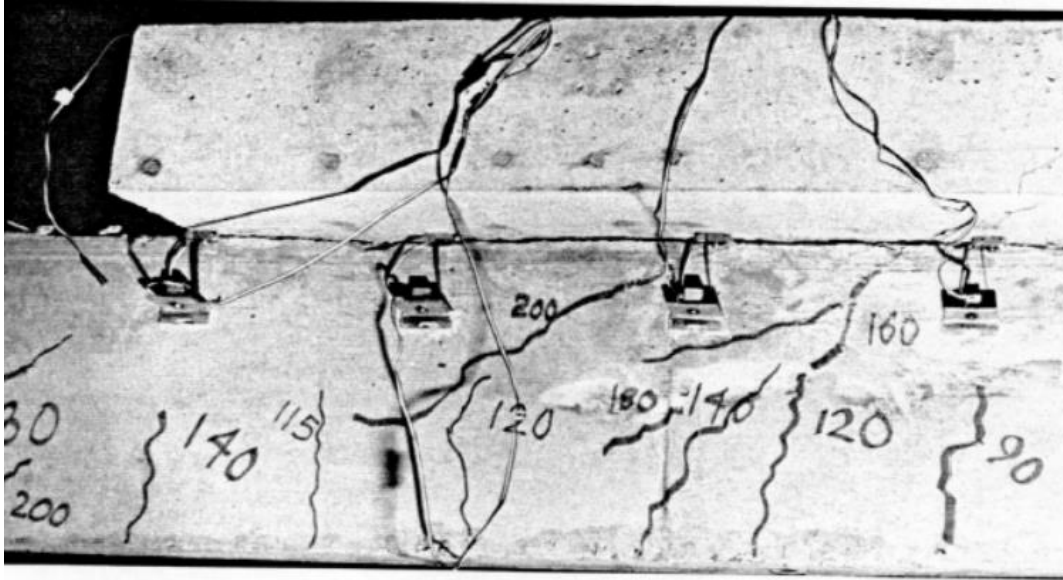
Horizontal shear failure mode for beams with short-discontinued flange.
